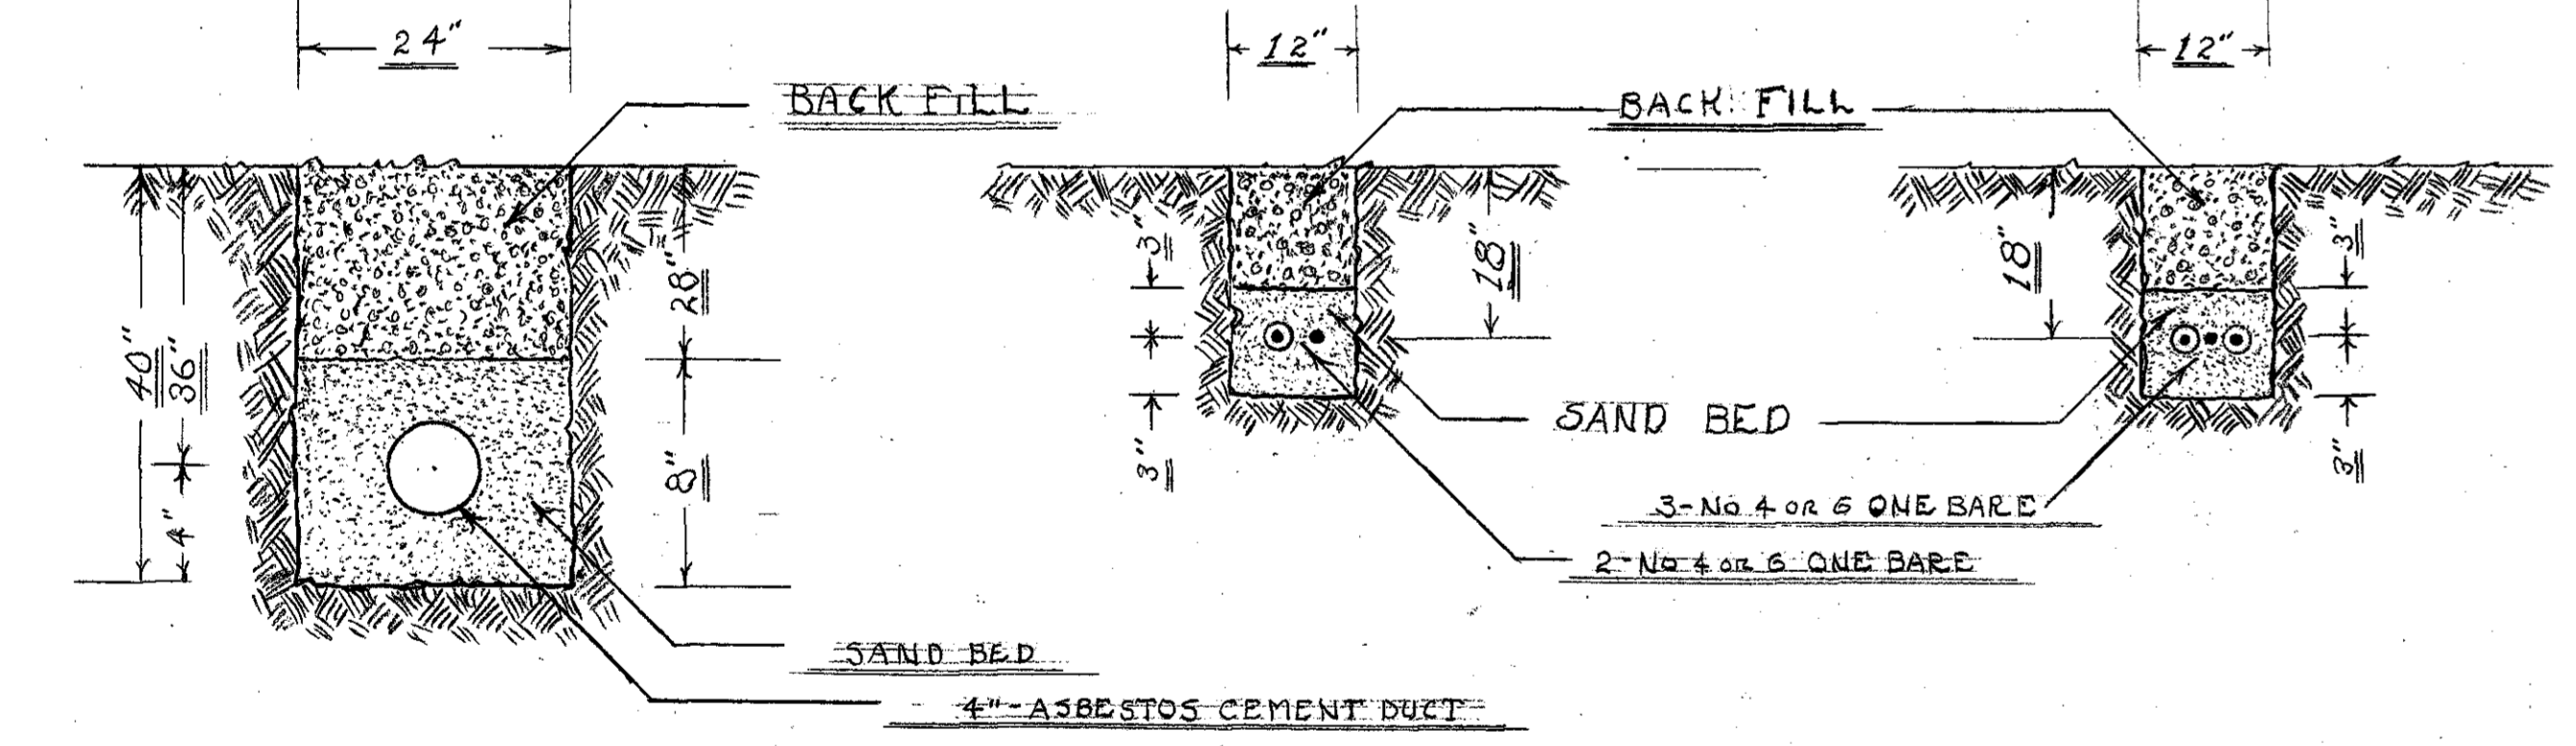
DETAILS OF EXISTING DUCTS UNDER PAVED AREAS.
